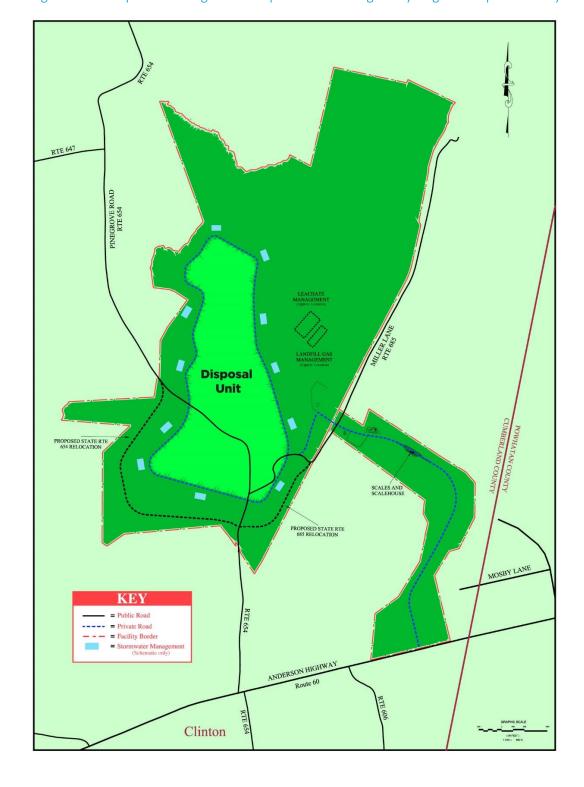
Conceptual Drawing of the Proposed Green Ridge Recycling and Disposal Facility¹
